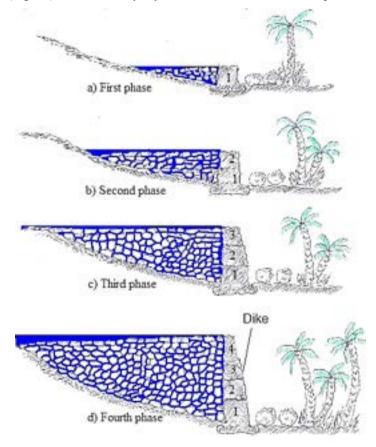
Stages of construction of a sand dam (Remini Diagram, 2025)
